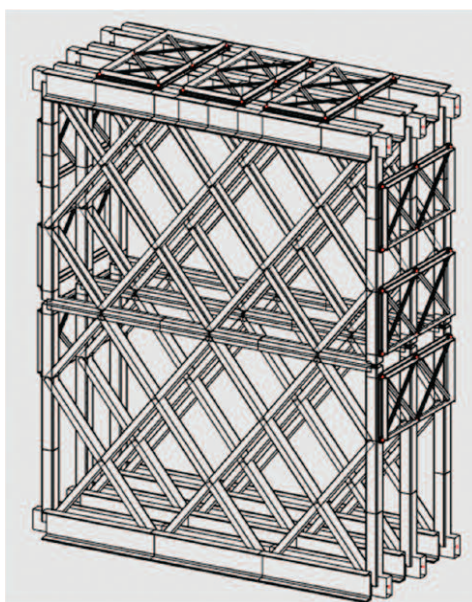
Structural design of the girder for a new portable road bridge in two-storey settings *Fig. own work
